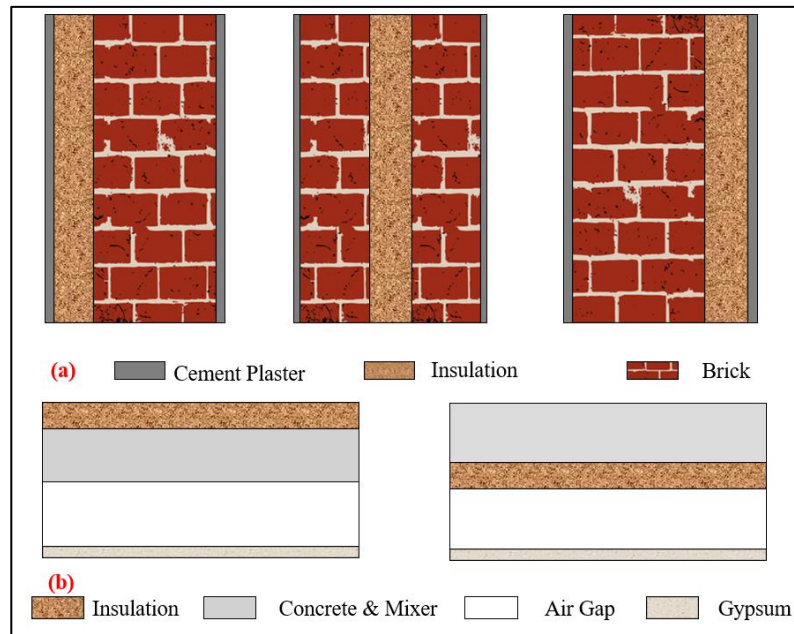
Building retrofitting setup for incorporation of insulation (a) wall (b) Roof
